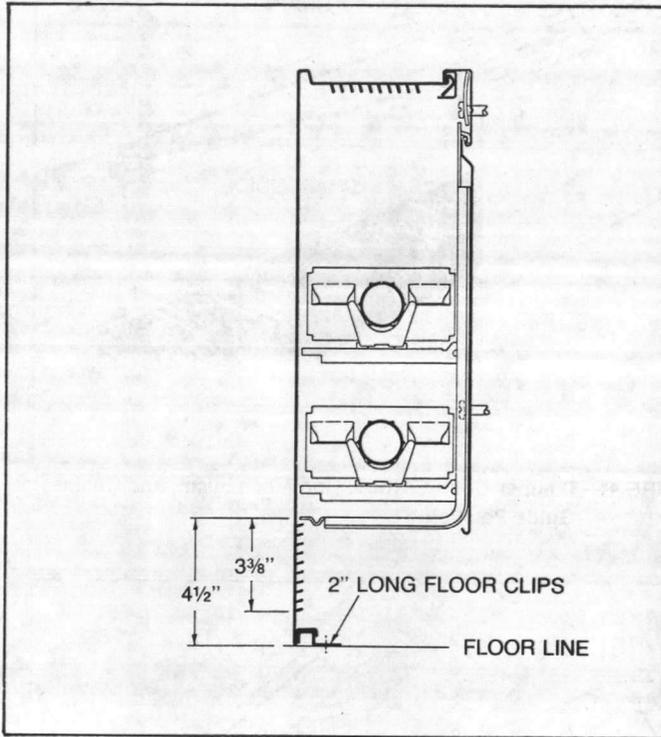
Front Inlet Enclosure with Floor Clips
